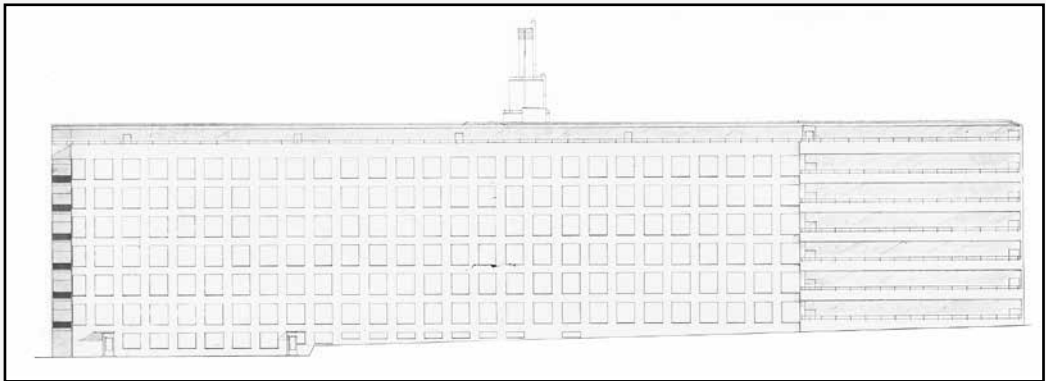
Master drawing of the south façade of A wing, April 1930. Drawing No. 50-98a. The drawing has been edited. AAM.
